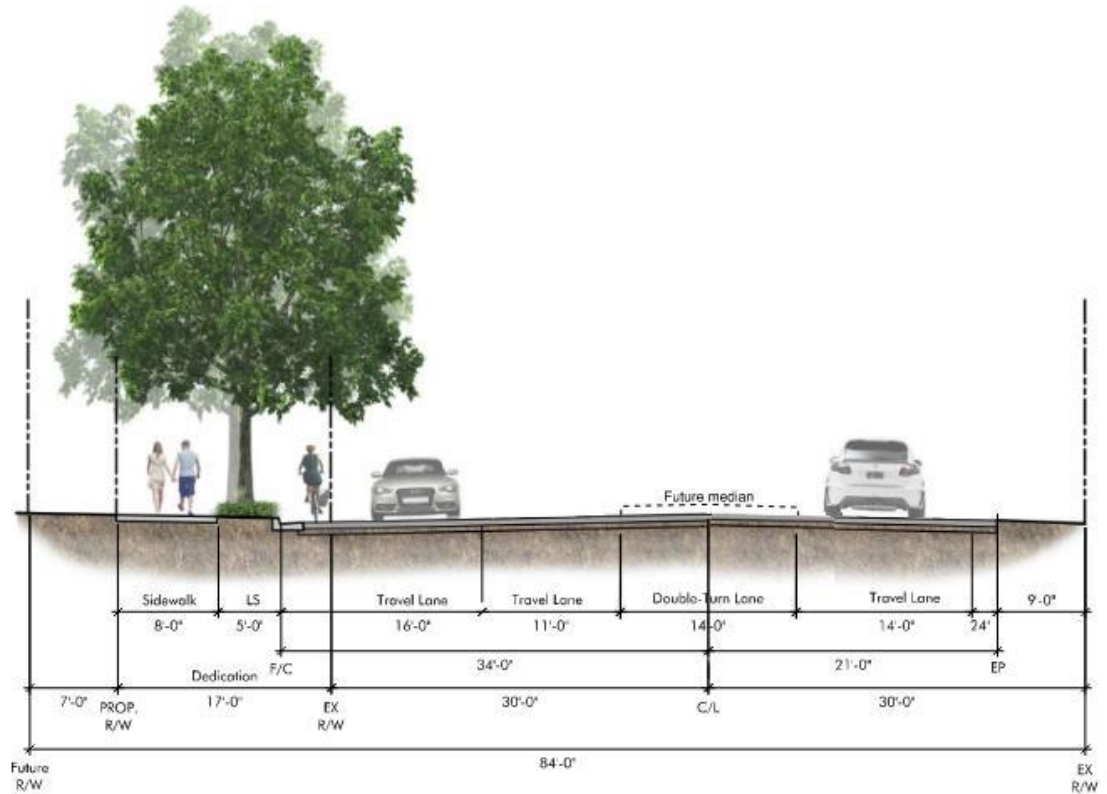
84' Austin Road – Adjacent to Existing Lot (NAP) —————
